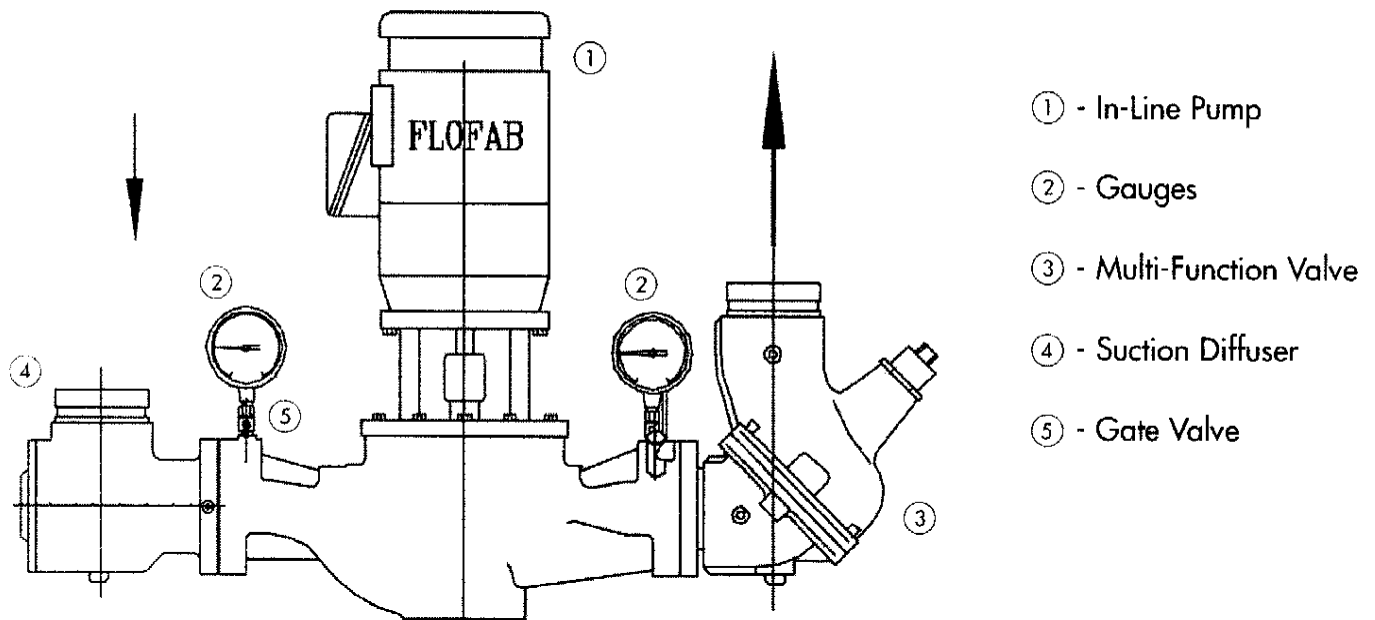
FIGURE IV - TYPICAL TYPE SC PUMP INSTALLATION
